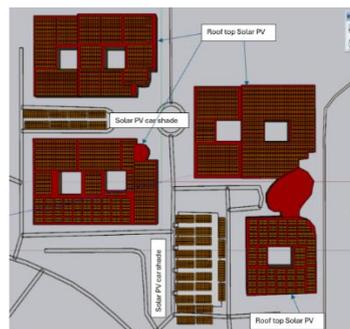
Digital model of FK buildings- site plan view featuring roof solar PV and solar PV car shade.
